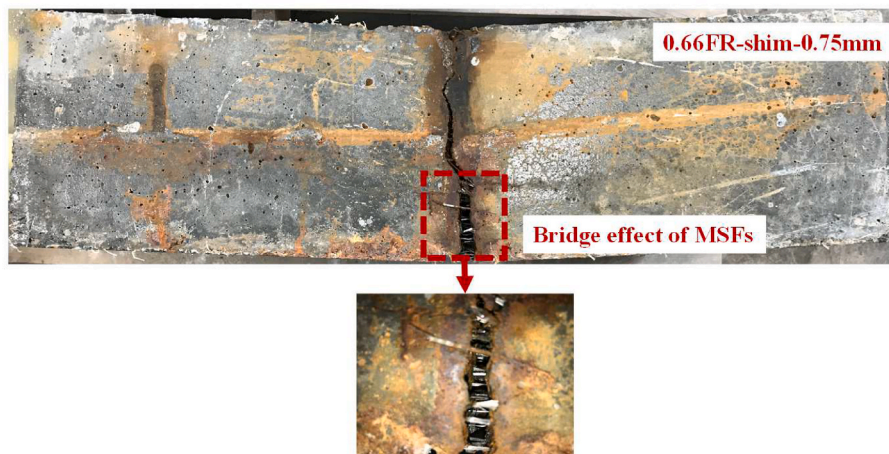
Bridge effect of MSF at the notch for exposed beams.
